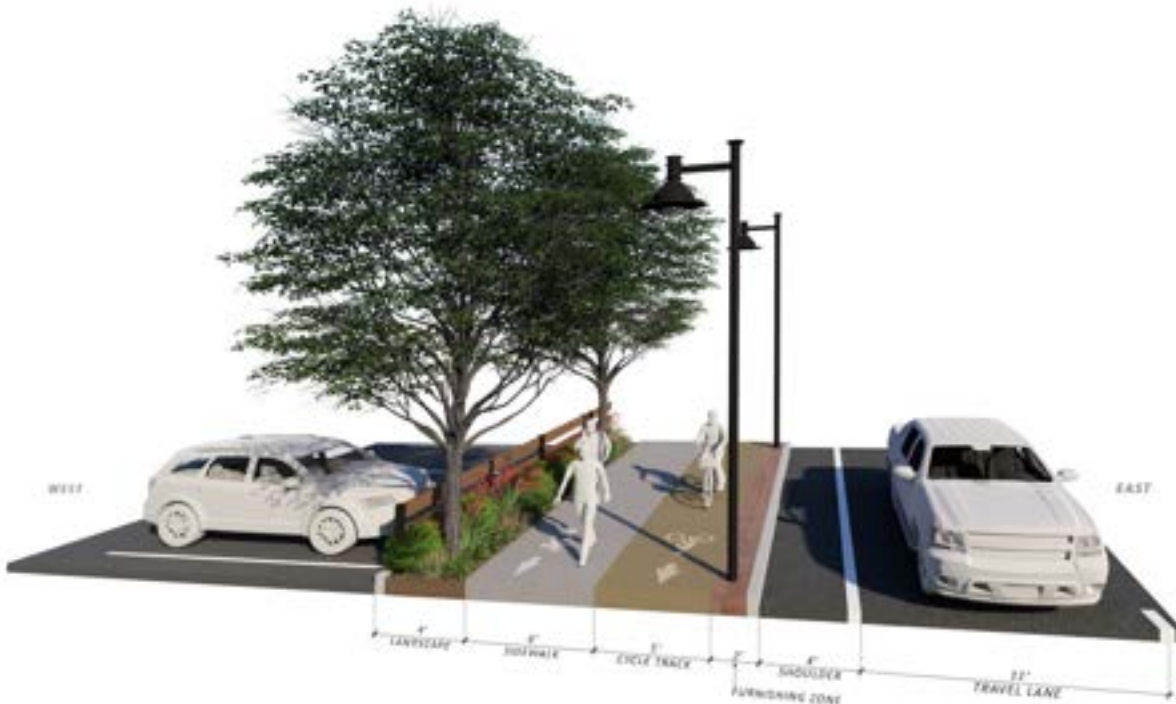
illustrates the roadway configuration, median and turn lane, U-turn pockets, cycletrack, sidewalk, and landscaped street edge.
